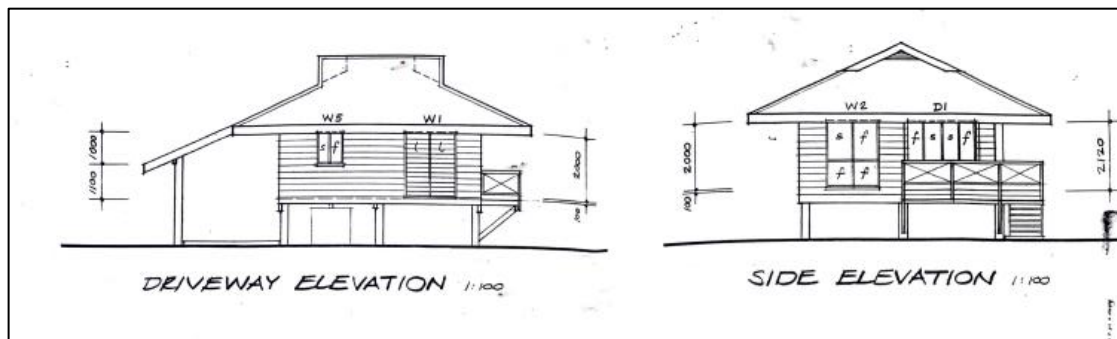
Elevation of new Caretaker's Residence (Lot 4)
